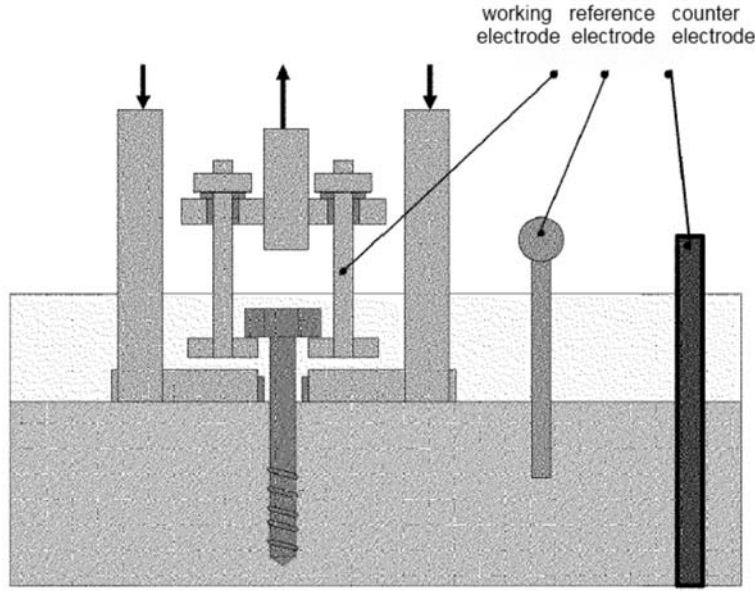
Details of Attachment for Anchor During Test for Brittleness of Concrete Screws (Test Method A)
